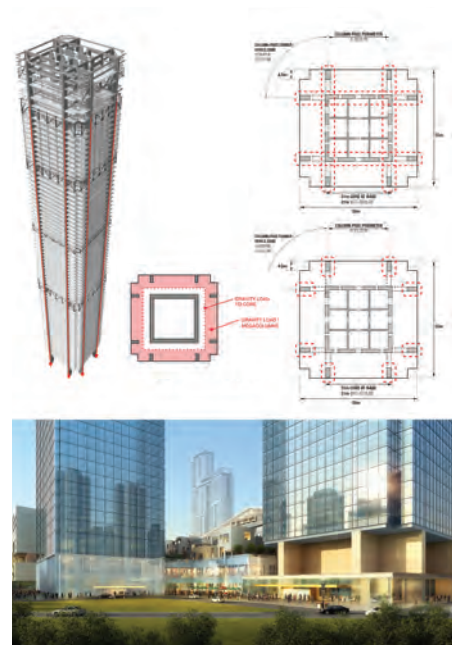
A perimeter girder plan and sections showing the optimal use of the balanced-cantilevering concept (Source: Skidmore, Owings & Merrill)
